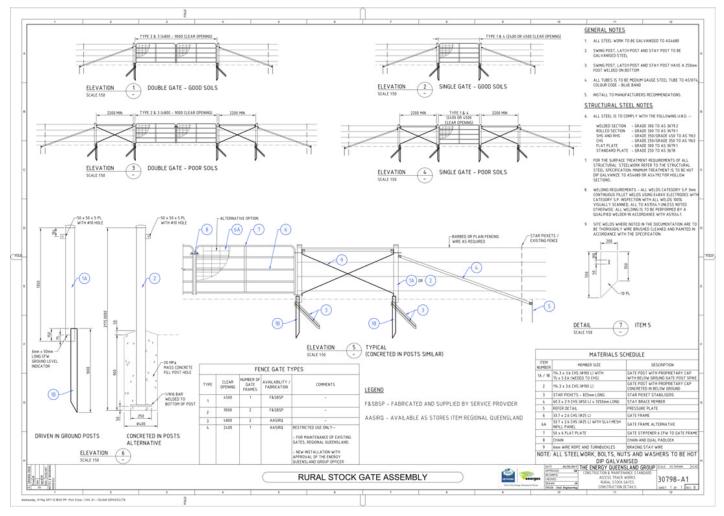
Access Track Infrastructure - Access Gate Construction and Fabrication Details.
